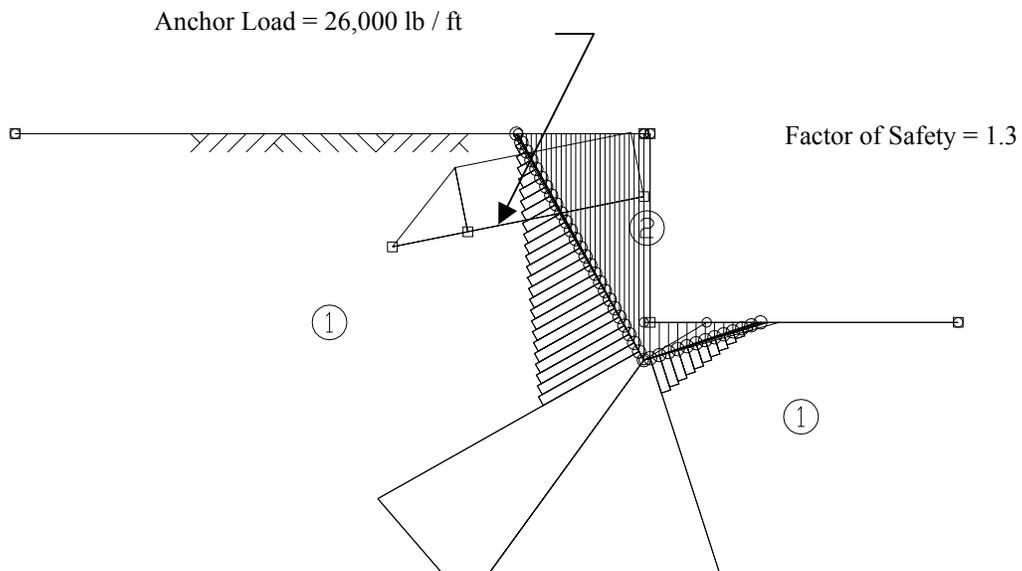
30-ft-high wall--elevation at final excavation stage
